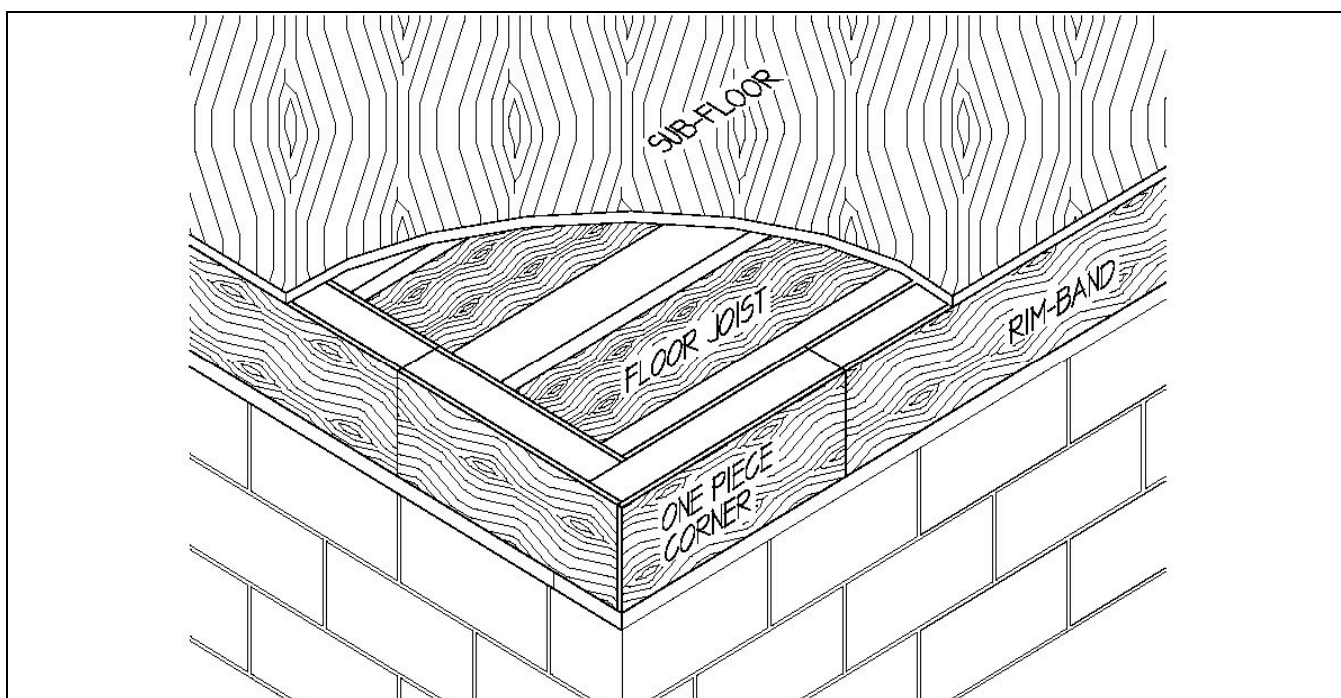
Band Panels: Band panels are set on the outside edge of the sill around the whole perimeter of the building. Overlap band panels on sills as called for in plans.
